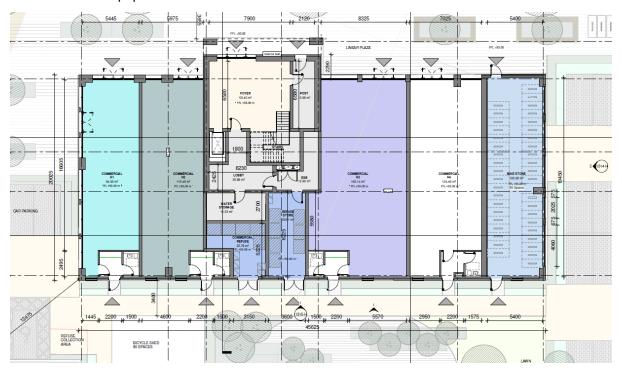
Commercial/Retail Units at Ground Floor Level in Block H
